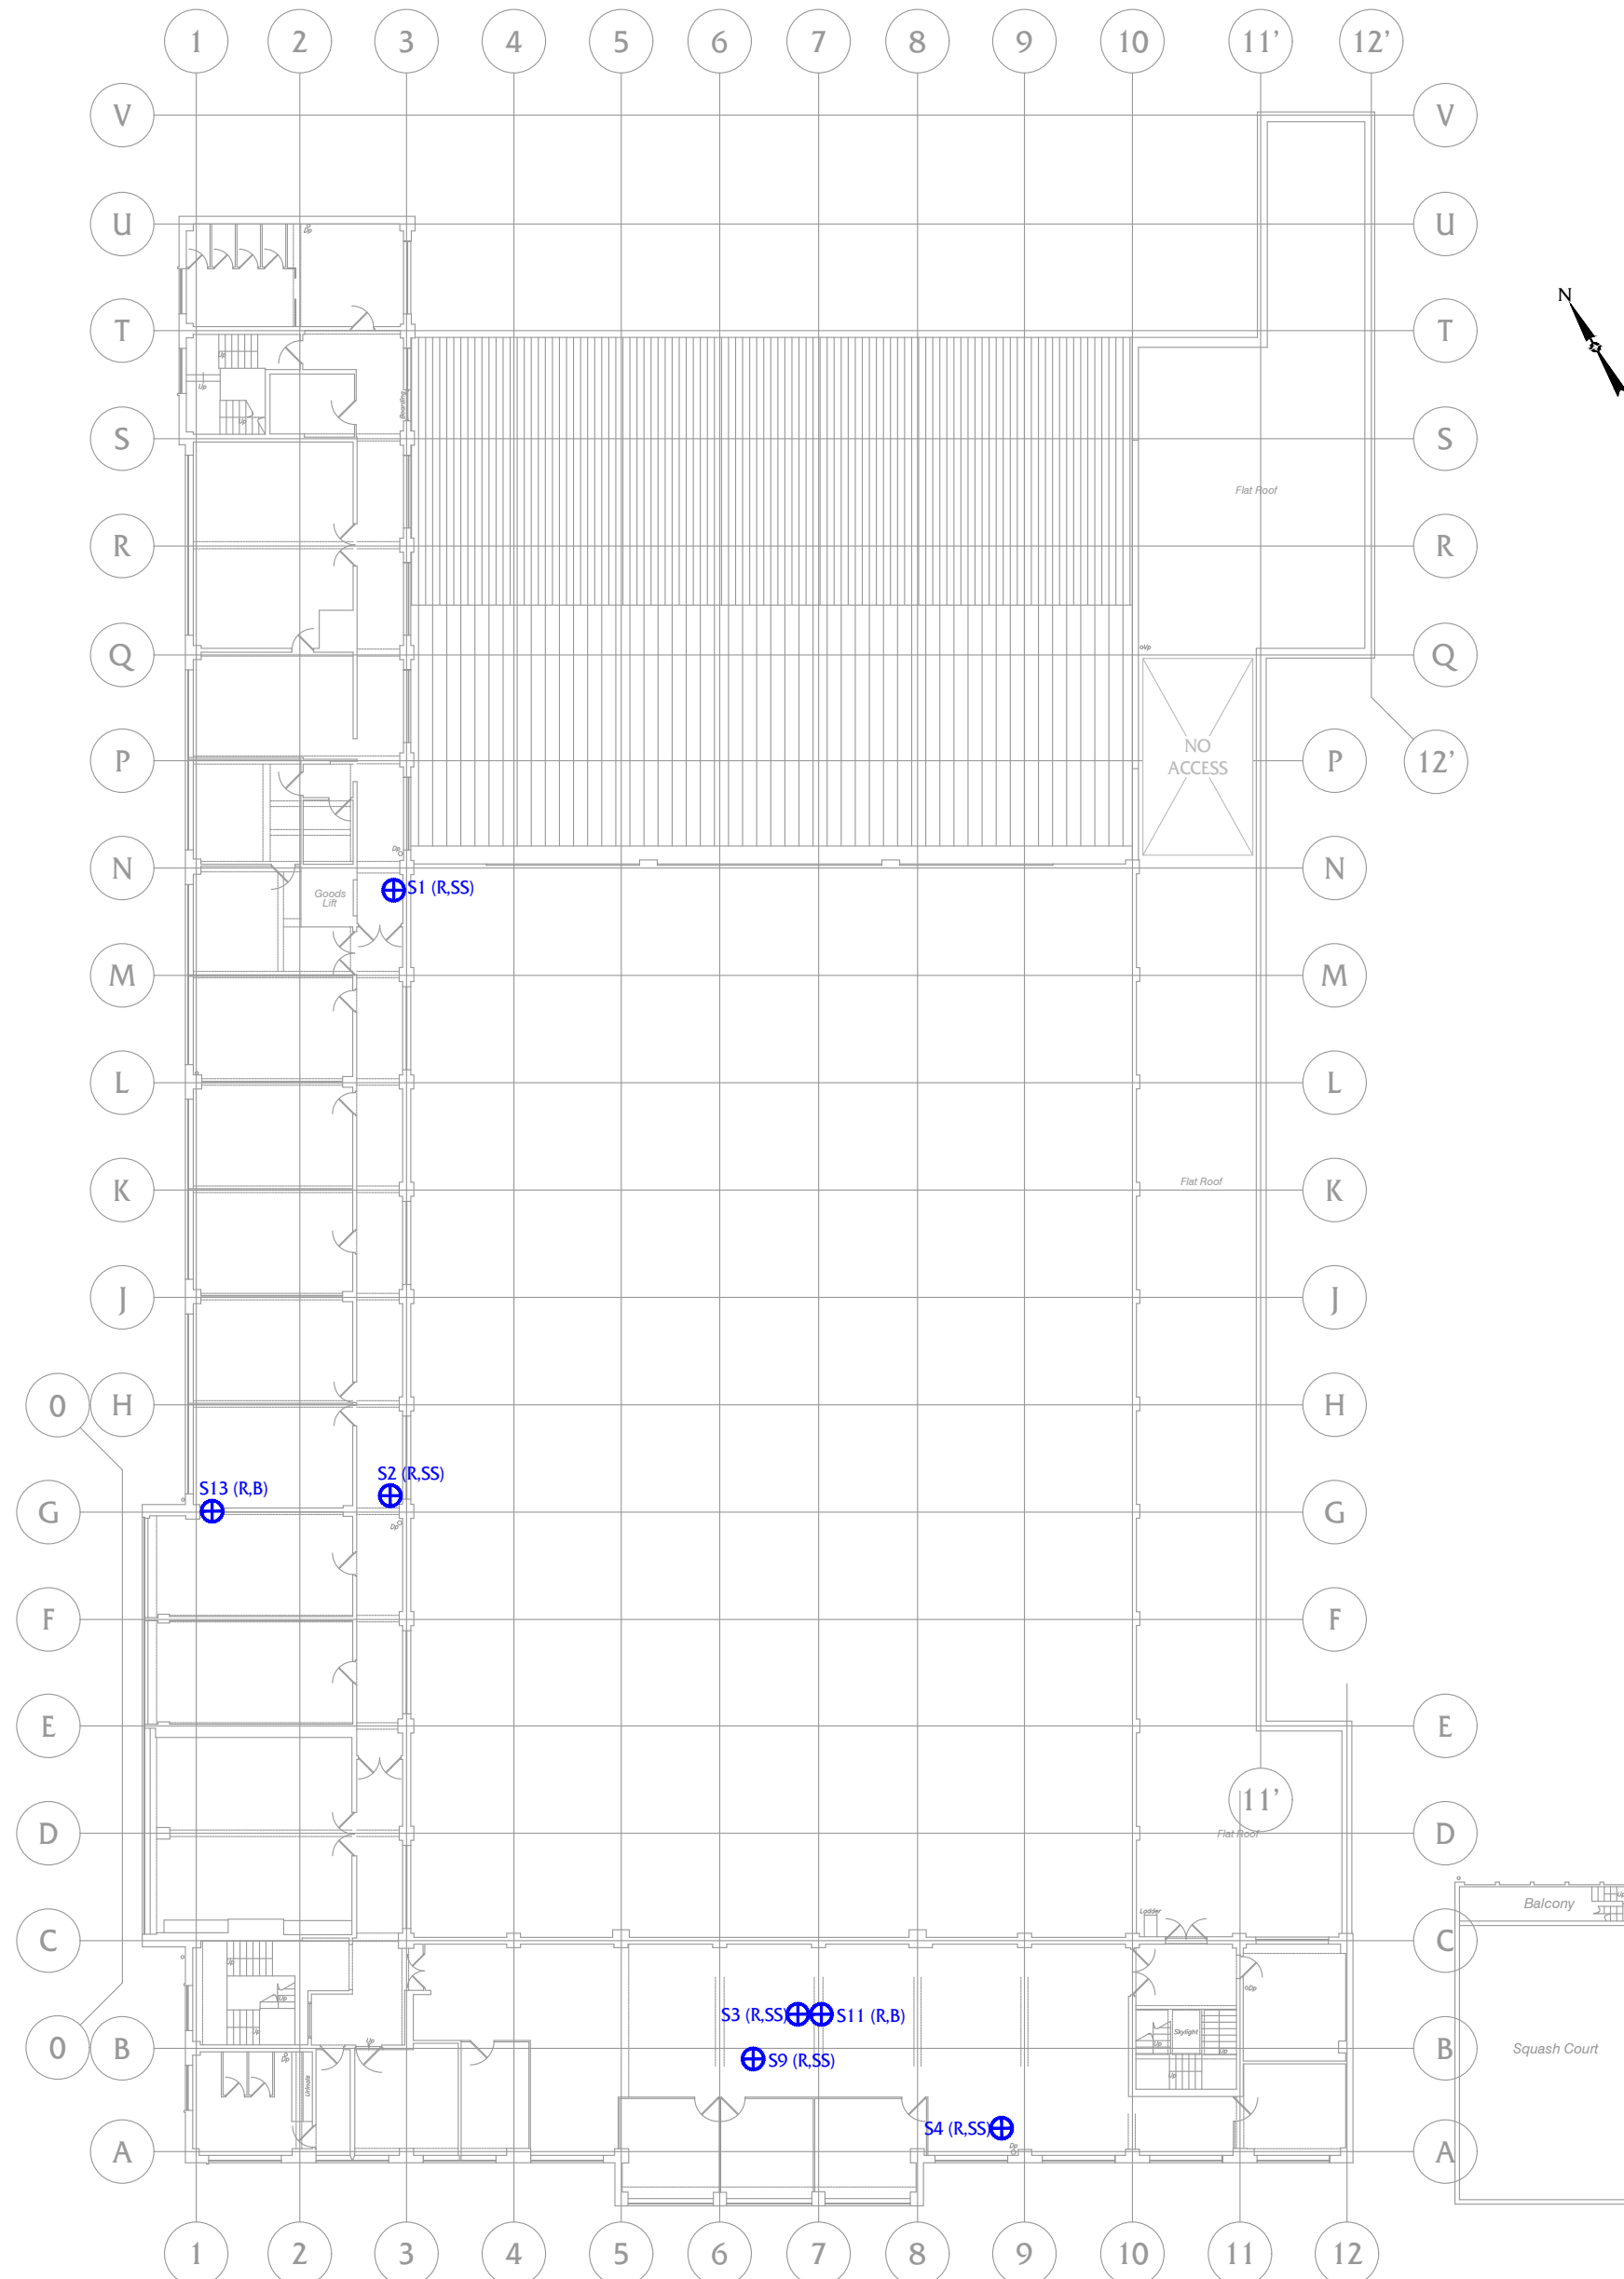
PLAN OF 1ST FLOOR SHOWING LOCATIONS OF SAMPLES TO ROOF SOFFIT OVER NOT TO SCALE
